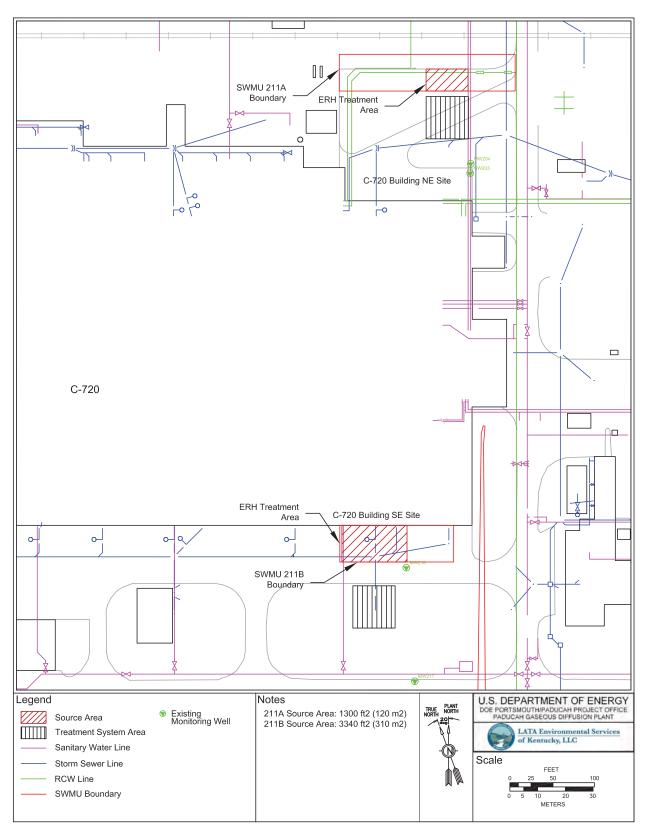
Plan View of Alternative 5 at C-720 Northeast and Southeast Sites
